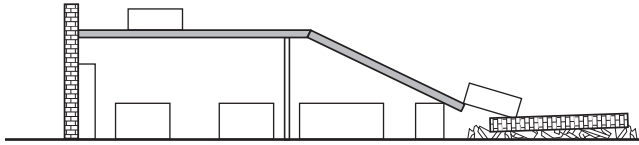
(c) Wall-Fall Collapse Pattern — Heavy Wall — Tilt-Up Construction.
